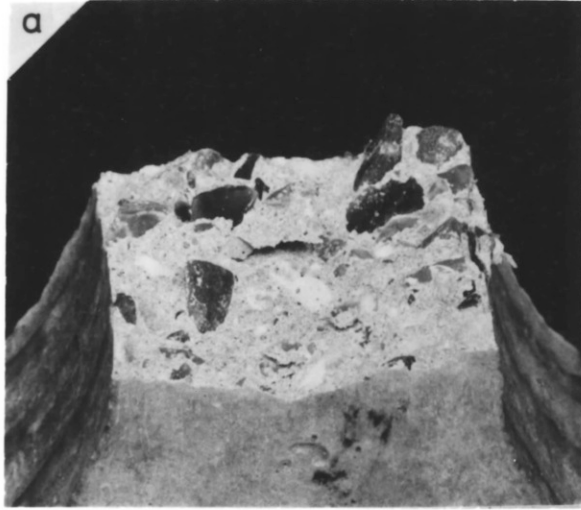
Fracture surfaces — Test F1
